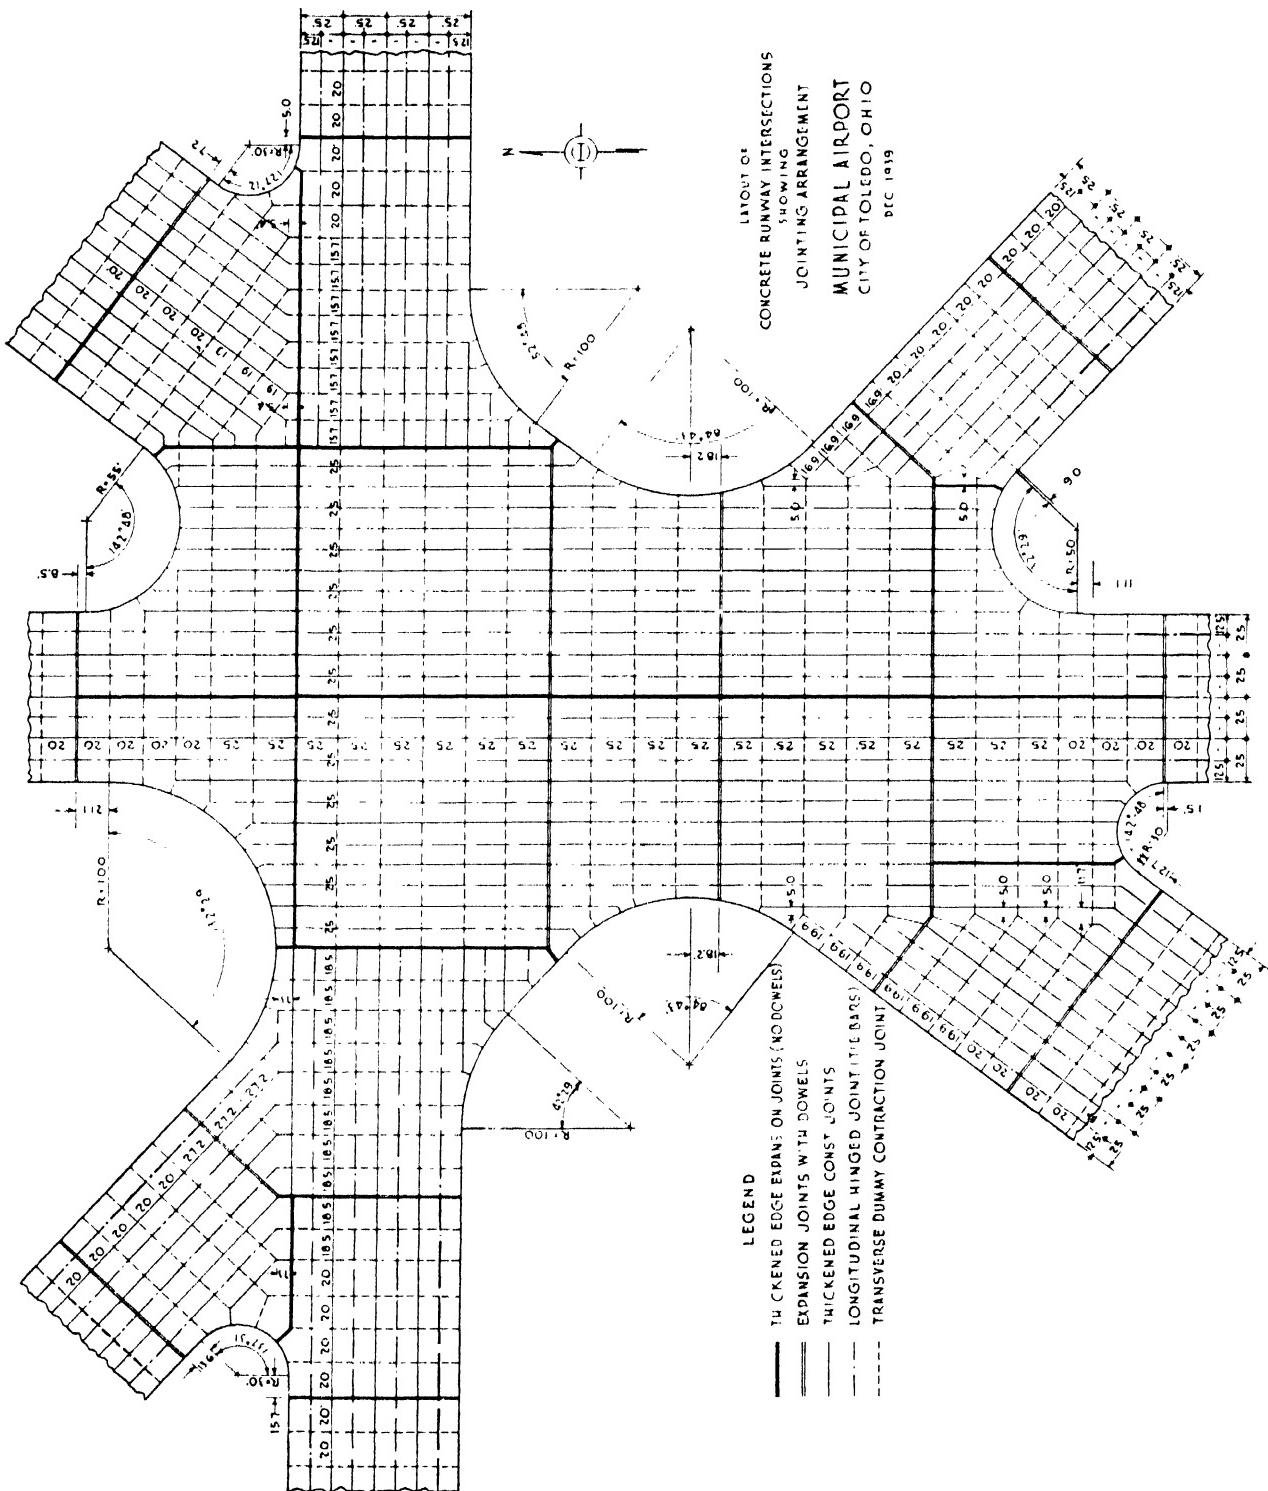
Typical plan for joining at intersection of two airport runways intersecting at right angles. Each runway 150 feet wide.
